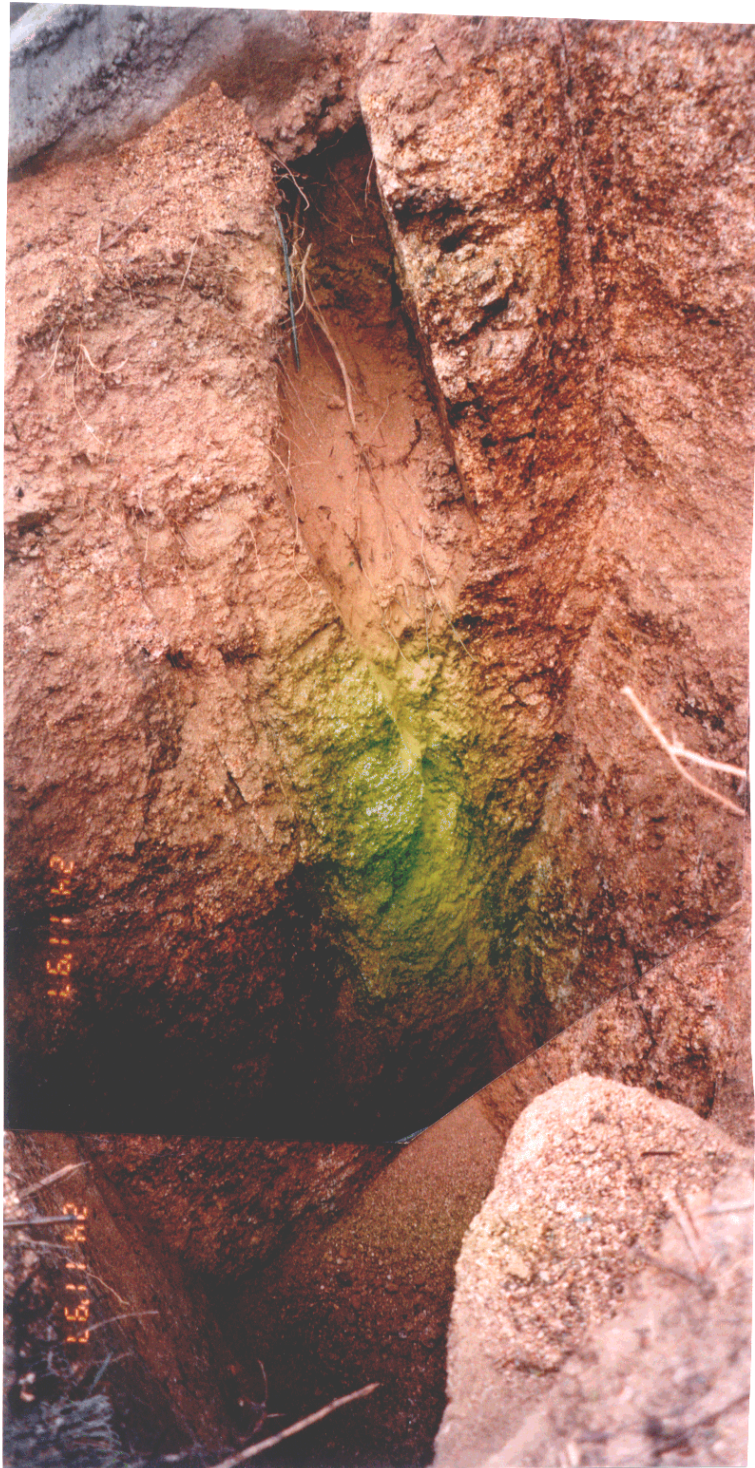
Tension Crack Exploiting Pre-existing Relict Joint in Completely Decomposed Granite in Trial Pit No. TP4 (Photograph Taken on 24 November 1997)
